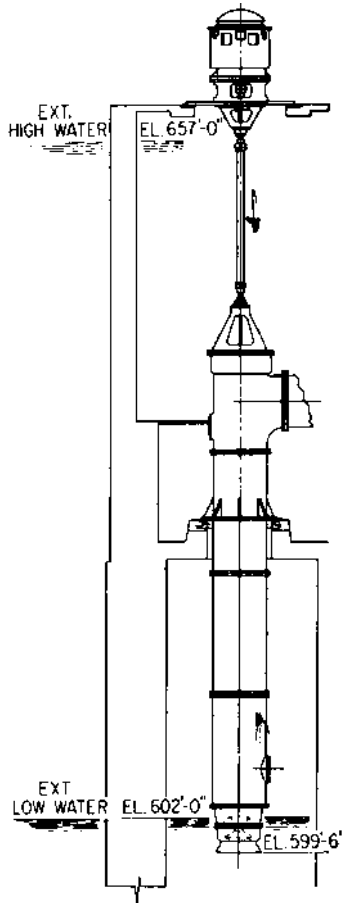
The vertical pump and driving motor supported separately (Flowsolve Corporation)
